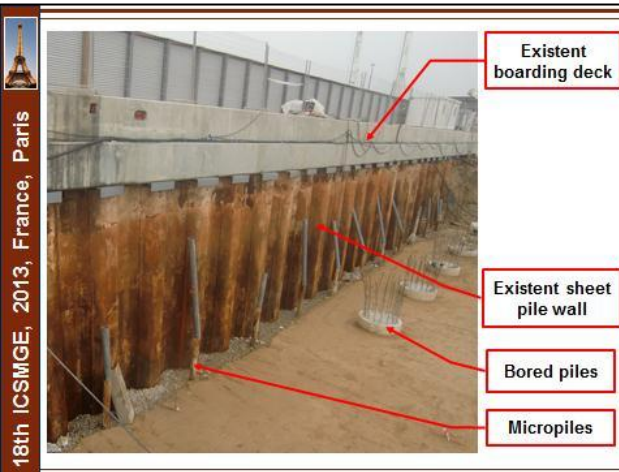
Solution T3 – view of the sheet pile wall after excavation.
